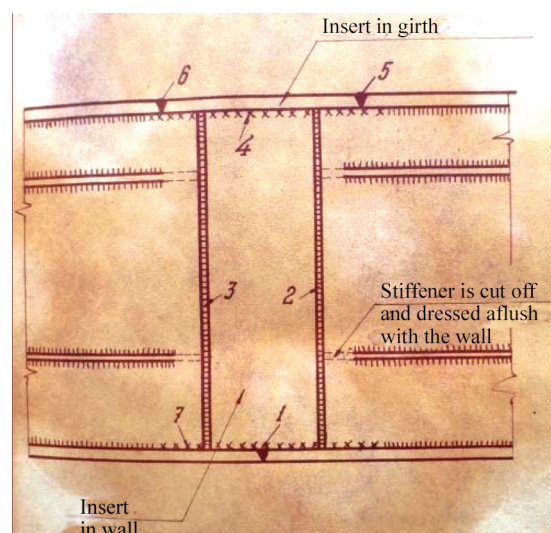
Order of erection assembly and welding of typical bridge trusses [4]
